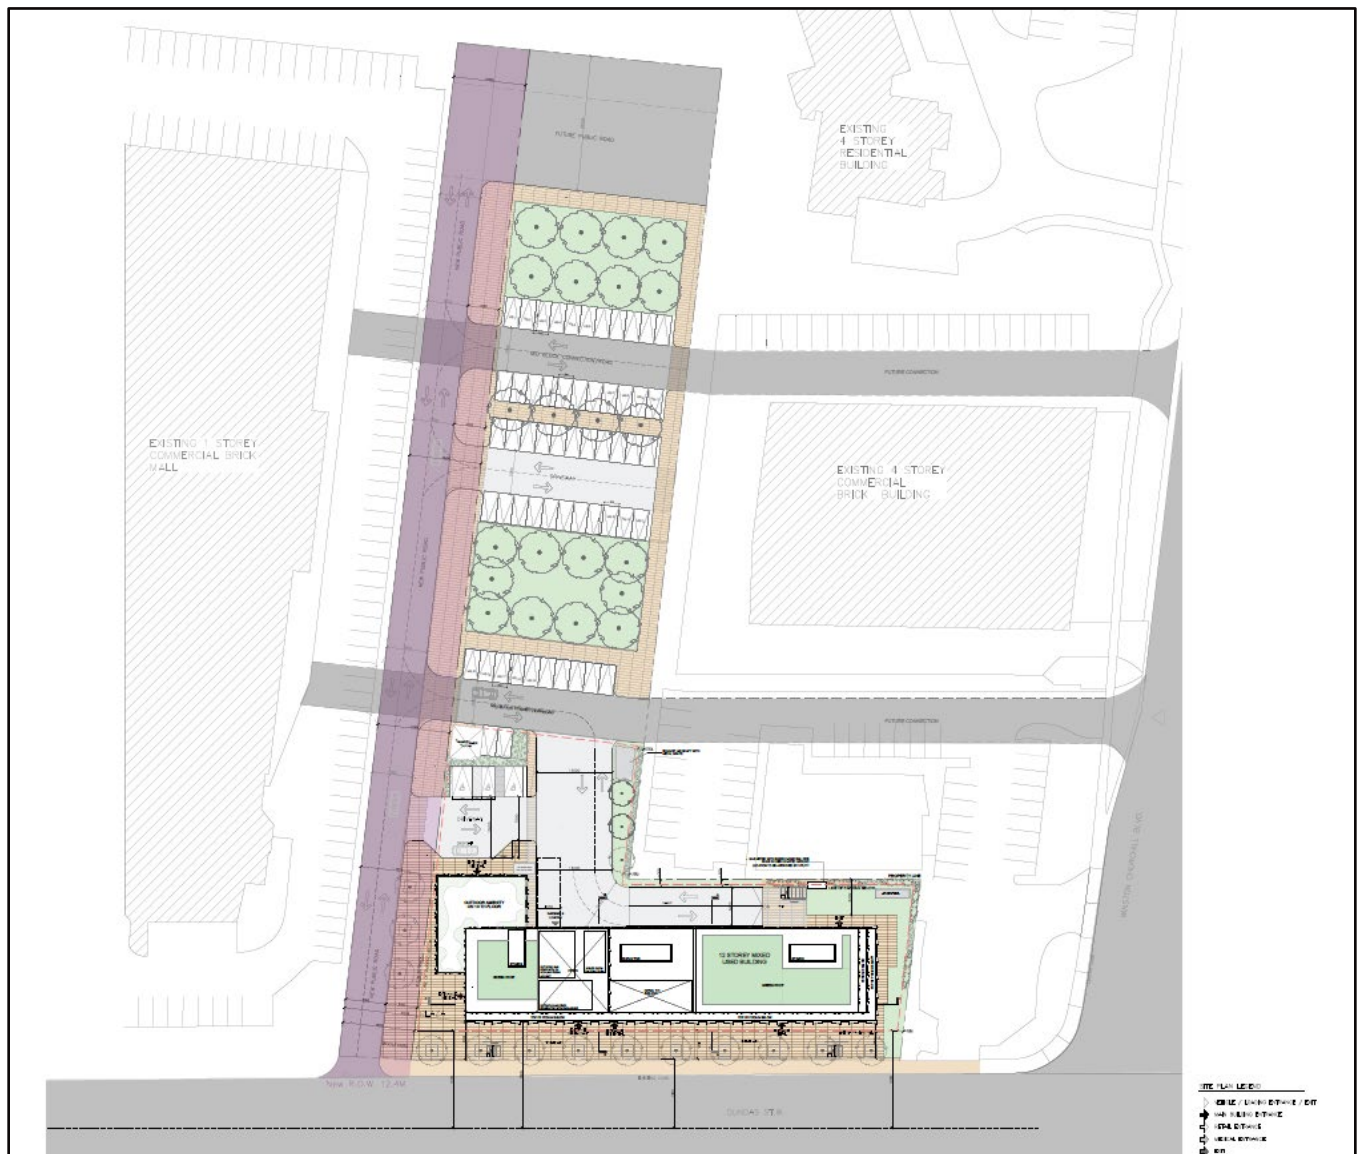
Proposed Conceptual Site Plan, Prepared by Hout Architecture
